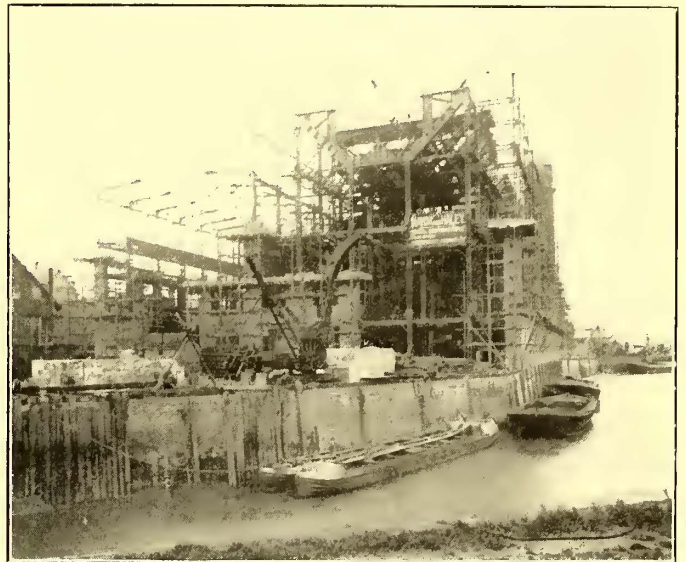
THAMES RIVER ELEVATION, WEST END
